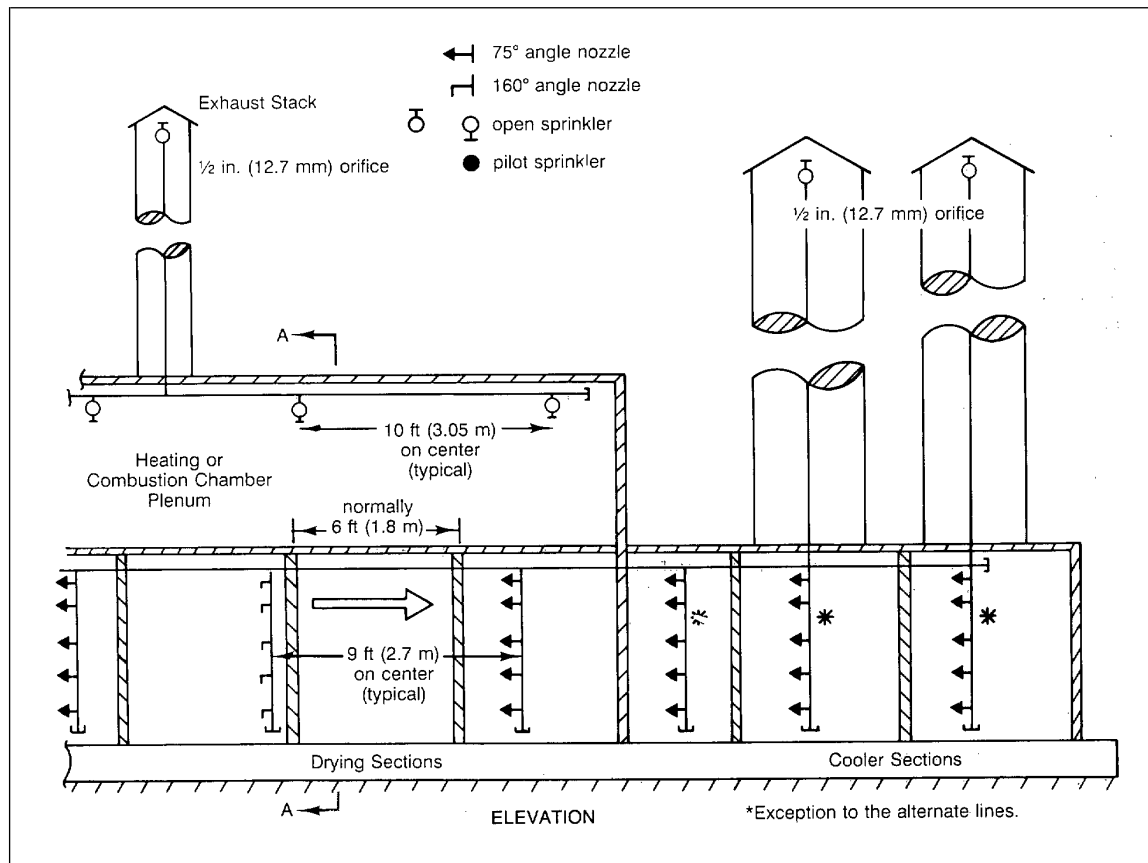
Typical arrangement of deluge protection for vertical jet-type dryer. See Fig. 7 for additional protection details.
